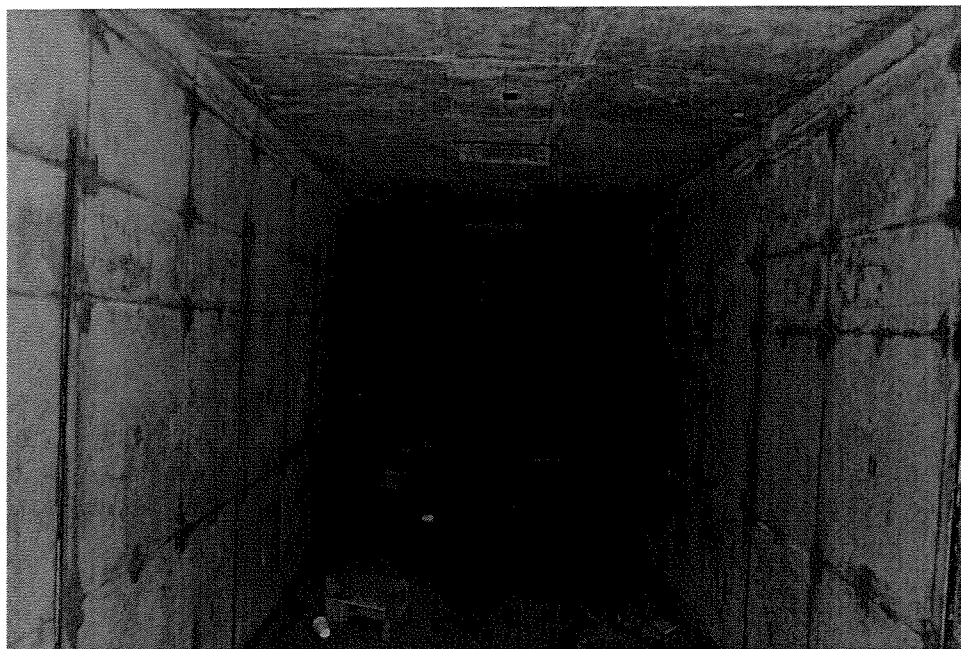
Test Stand No. 2, Alpha Test Complex, 1956-1957. Instrumentation tunnel. Looking northwest. View of May 2005.
